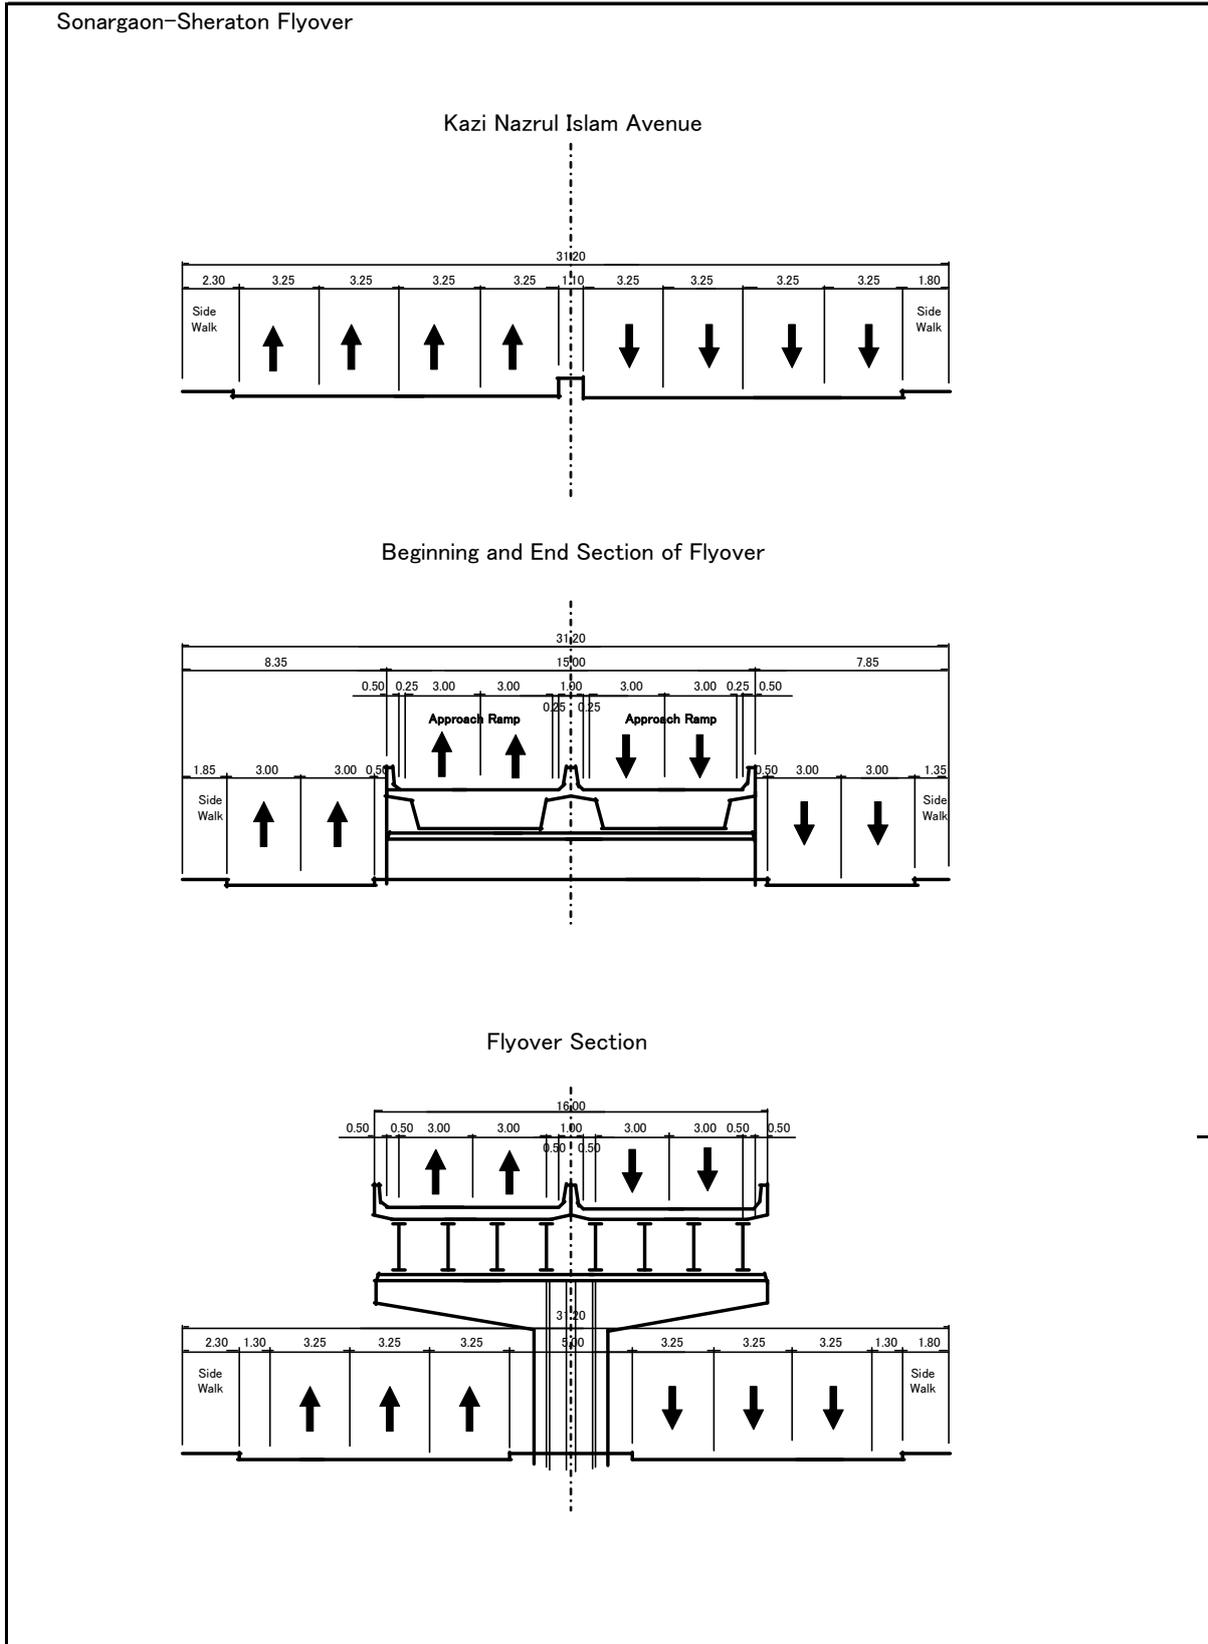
Typical Cross Section of Sonargaon Flyover Plan
